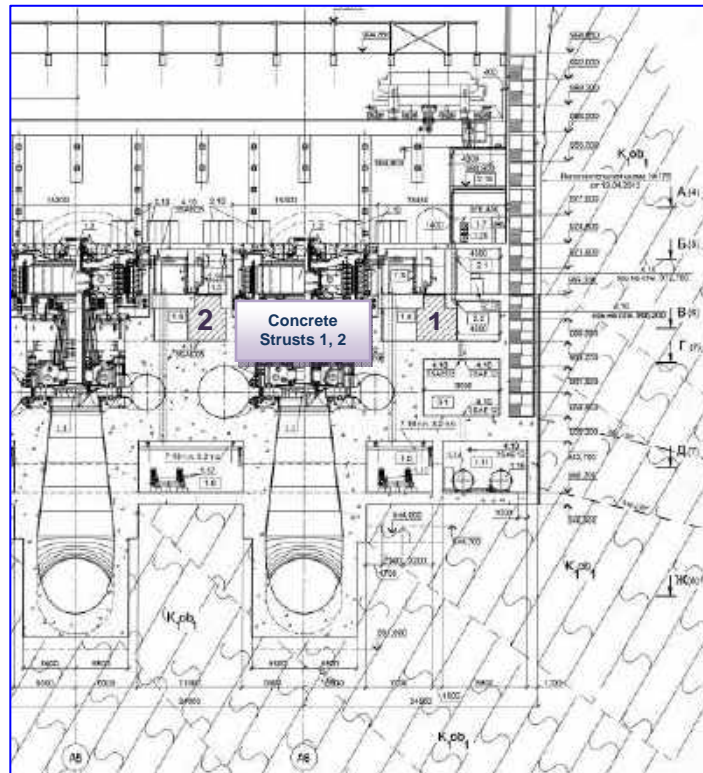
Longitudinal section. View of the zone in siltstone area with Units 5 and 6. Reinforced concrete struts 1, 2
